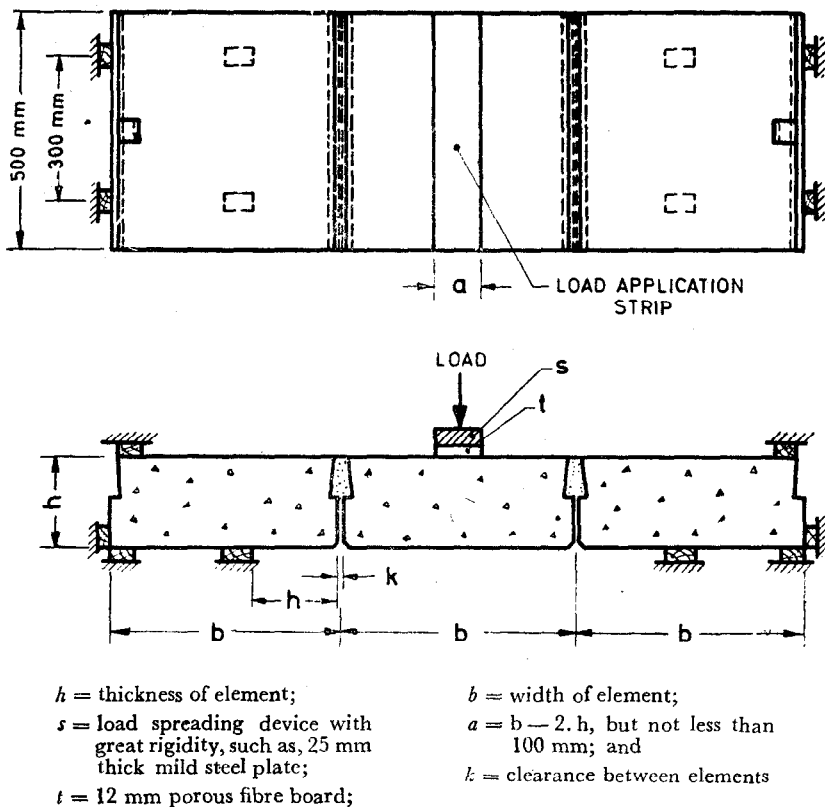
LOADING ARRANGEMENT FOR JOINTED ELEMENTS OF CELLULAR CONCRETE
